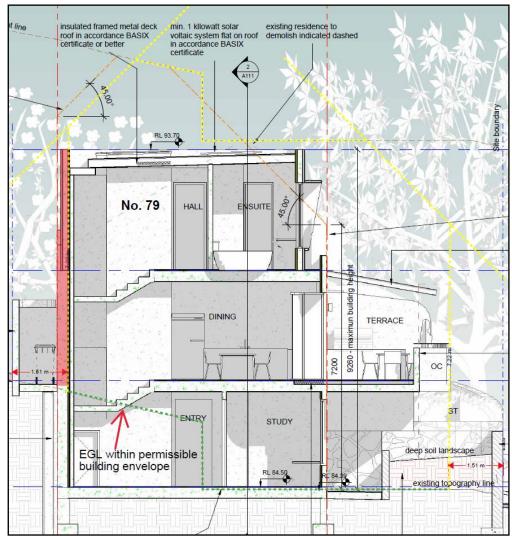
EGL within building envelope shown with dashed green line. *Source:* Submitted Architectural Plans. *Annotated:* WMC
